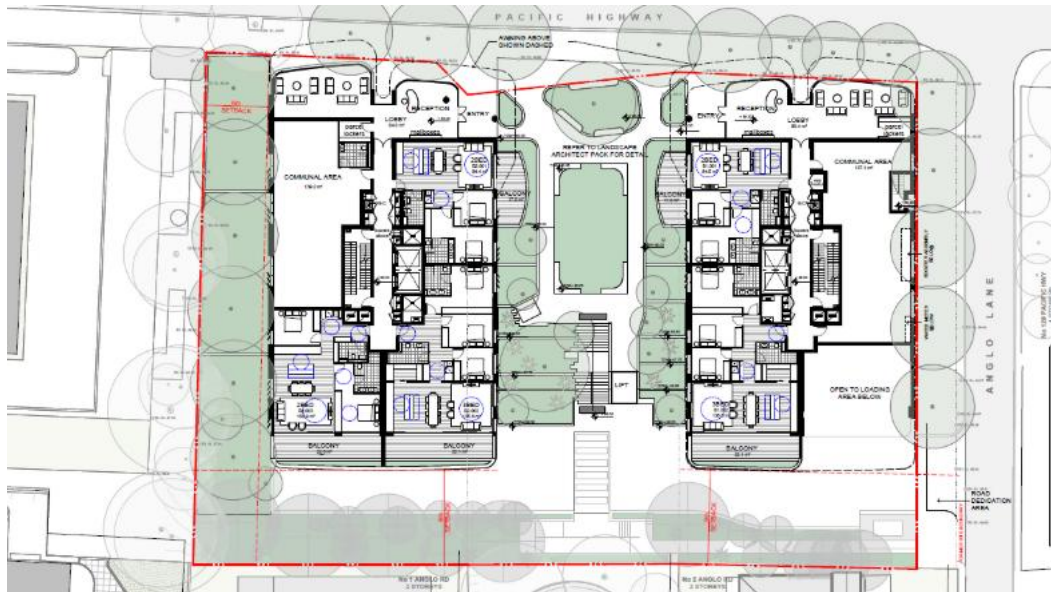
Proposed ground floor plan (Source: Marchese Partners)
